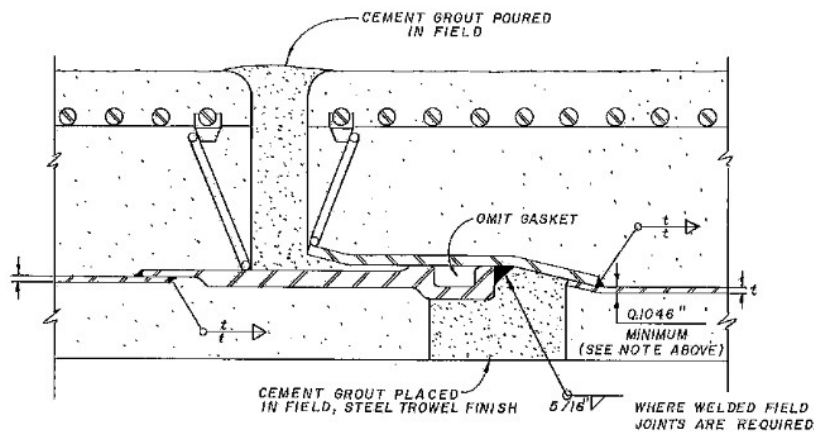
FIELD WELD JOINT FOR PRESTRESSED CONCRETE CYLINDER PIPE (1972)
